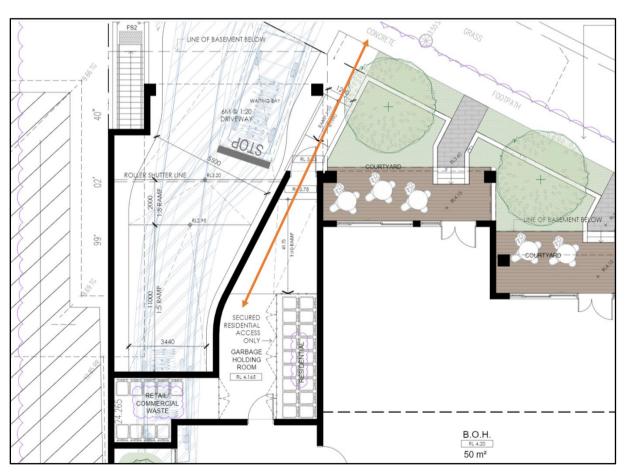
Ground Floor Plan – Draft for Submission, 1105 to 1107 Barrenjoey Road Palm Beach, PBD Architects, Revised 29/08/2022 (Bin Path – Orange Arrow)
